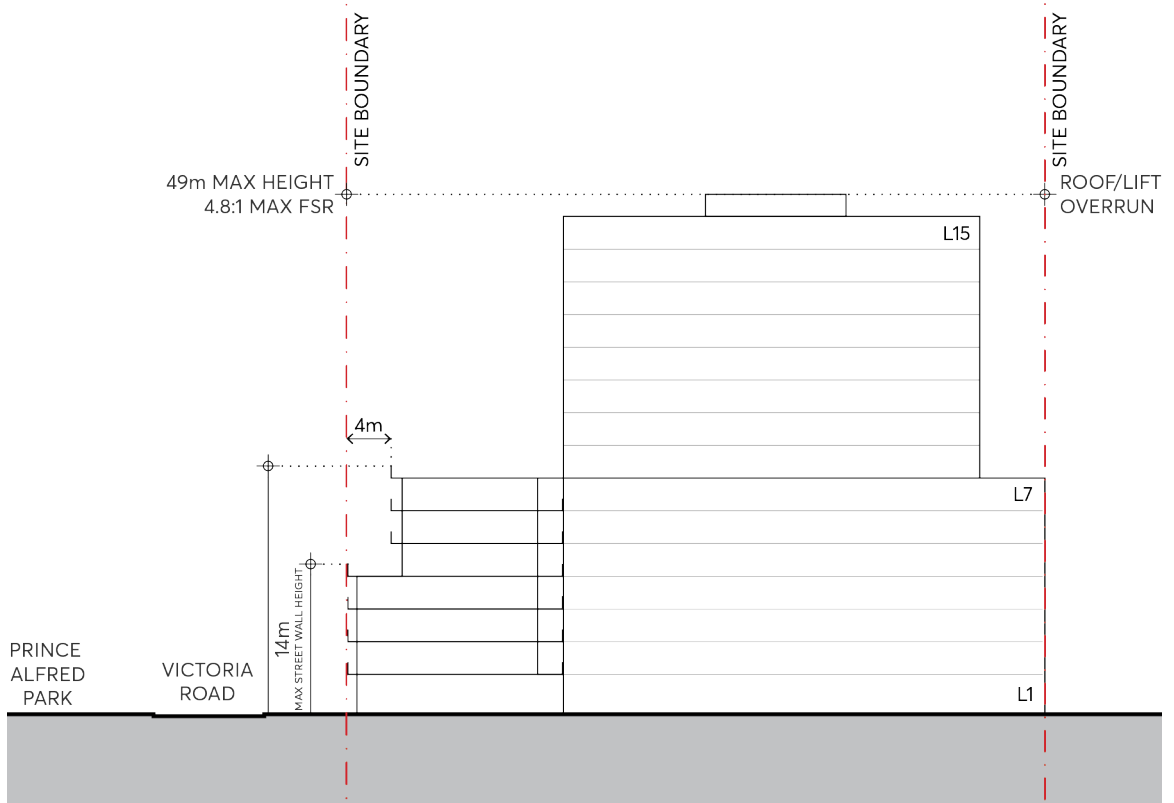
North - South Section of Site Building Envelope
